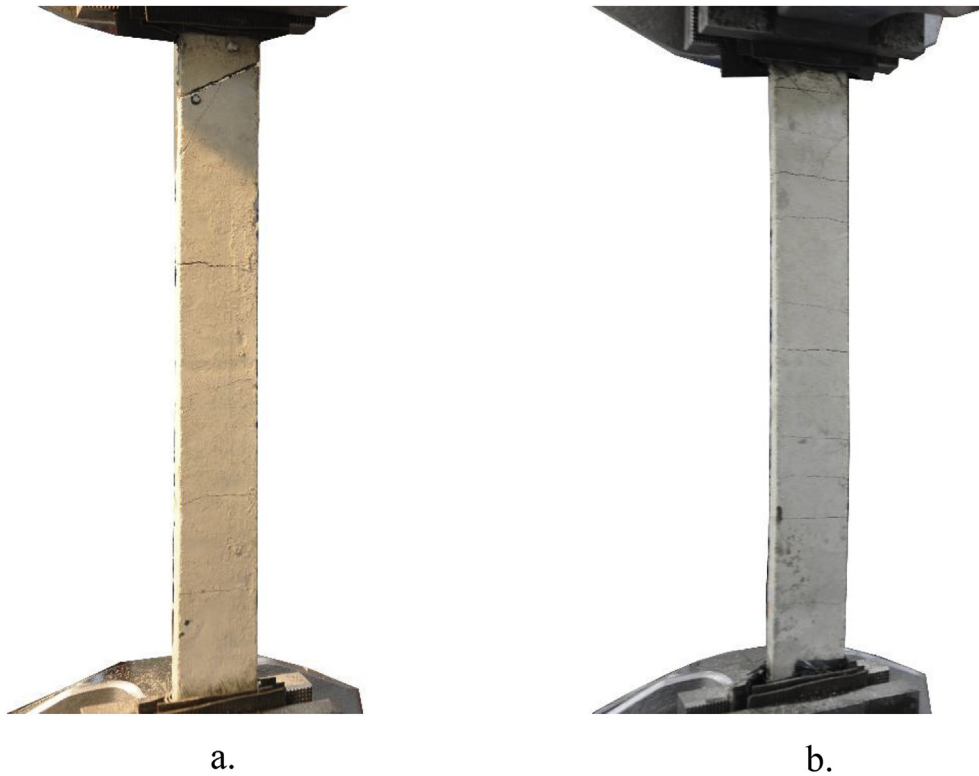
a) Opening of a major crack close to the grips at the end of test in specimen R_CS80_500_45_2. b) Crack pattern of specimen R_CS80_500_45_3.
